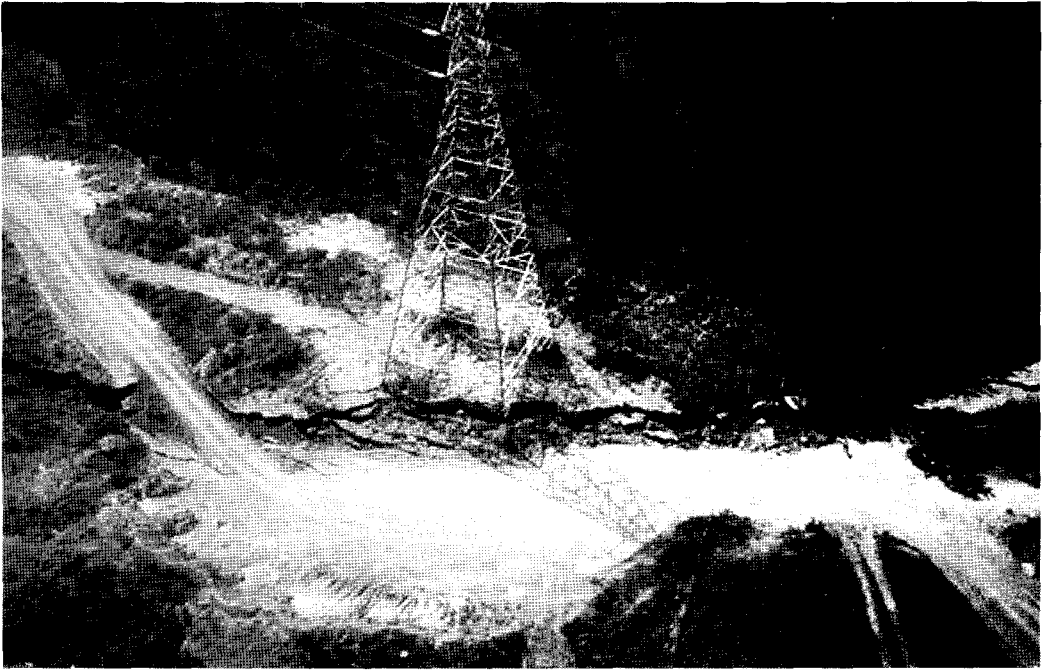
Aerial view of the normal fault along the Gölcük segment east of Gölcük, near the Ford-Otosan plant. Fault rupture crosses beneath one footing of the tower, which was pulled out of the soil, preventing damage to the tower lattice.
